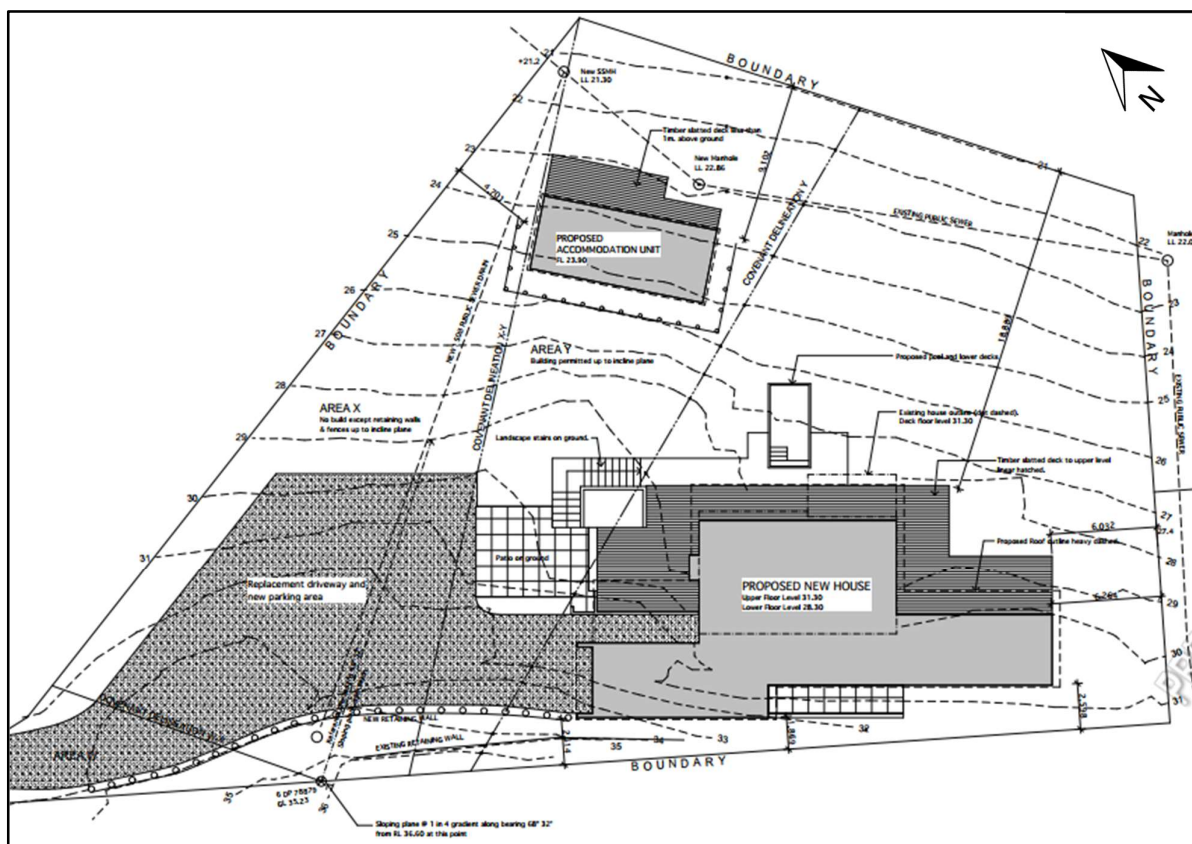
Proposed Site Plan (Source: Spooner Architectural Solutions, dated 19 August 2025)
